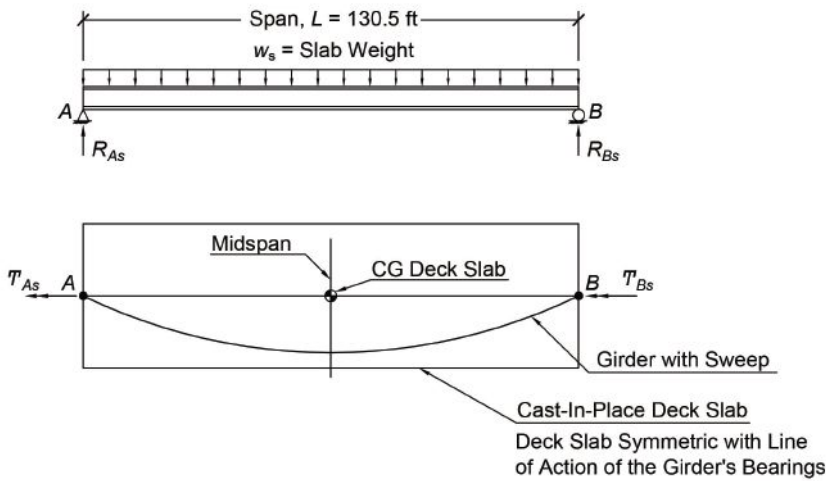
SCHEMATIC ELEVATION AND PLAN VIEWS
